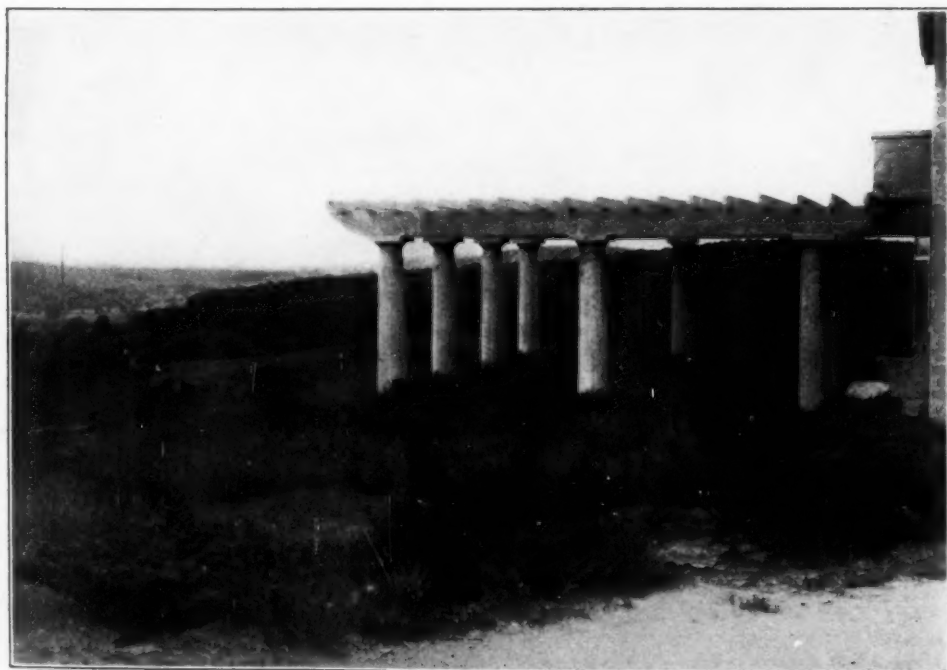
CONCRETE PERGOLA—PEARMAIN HOUSE.
